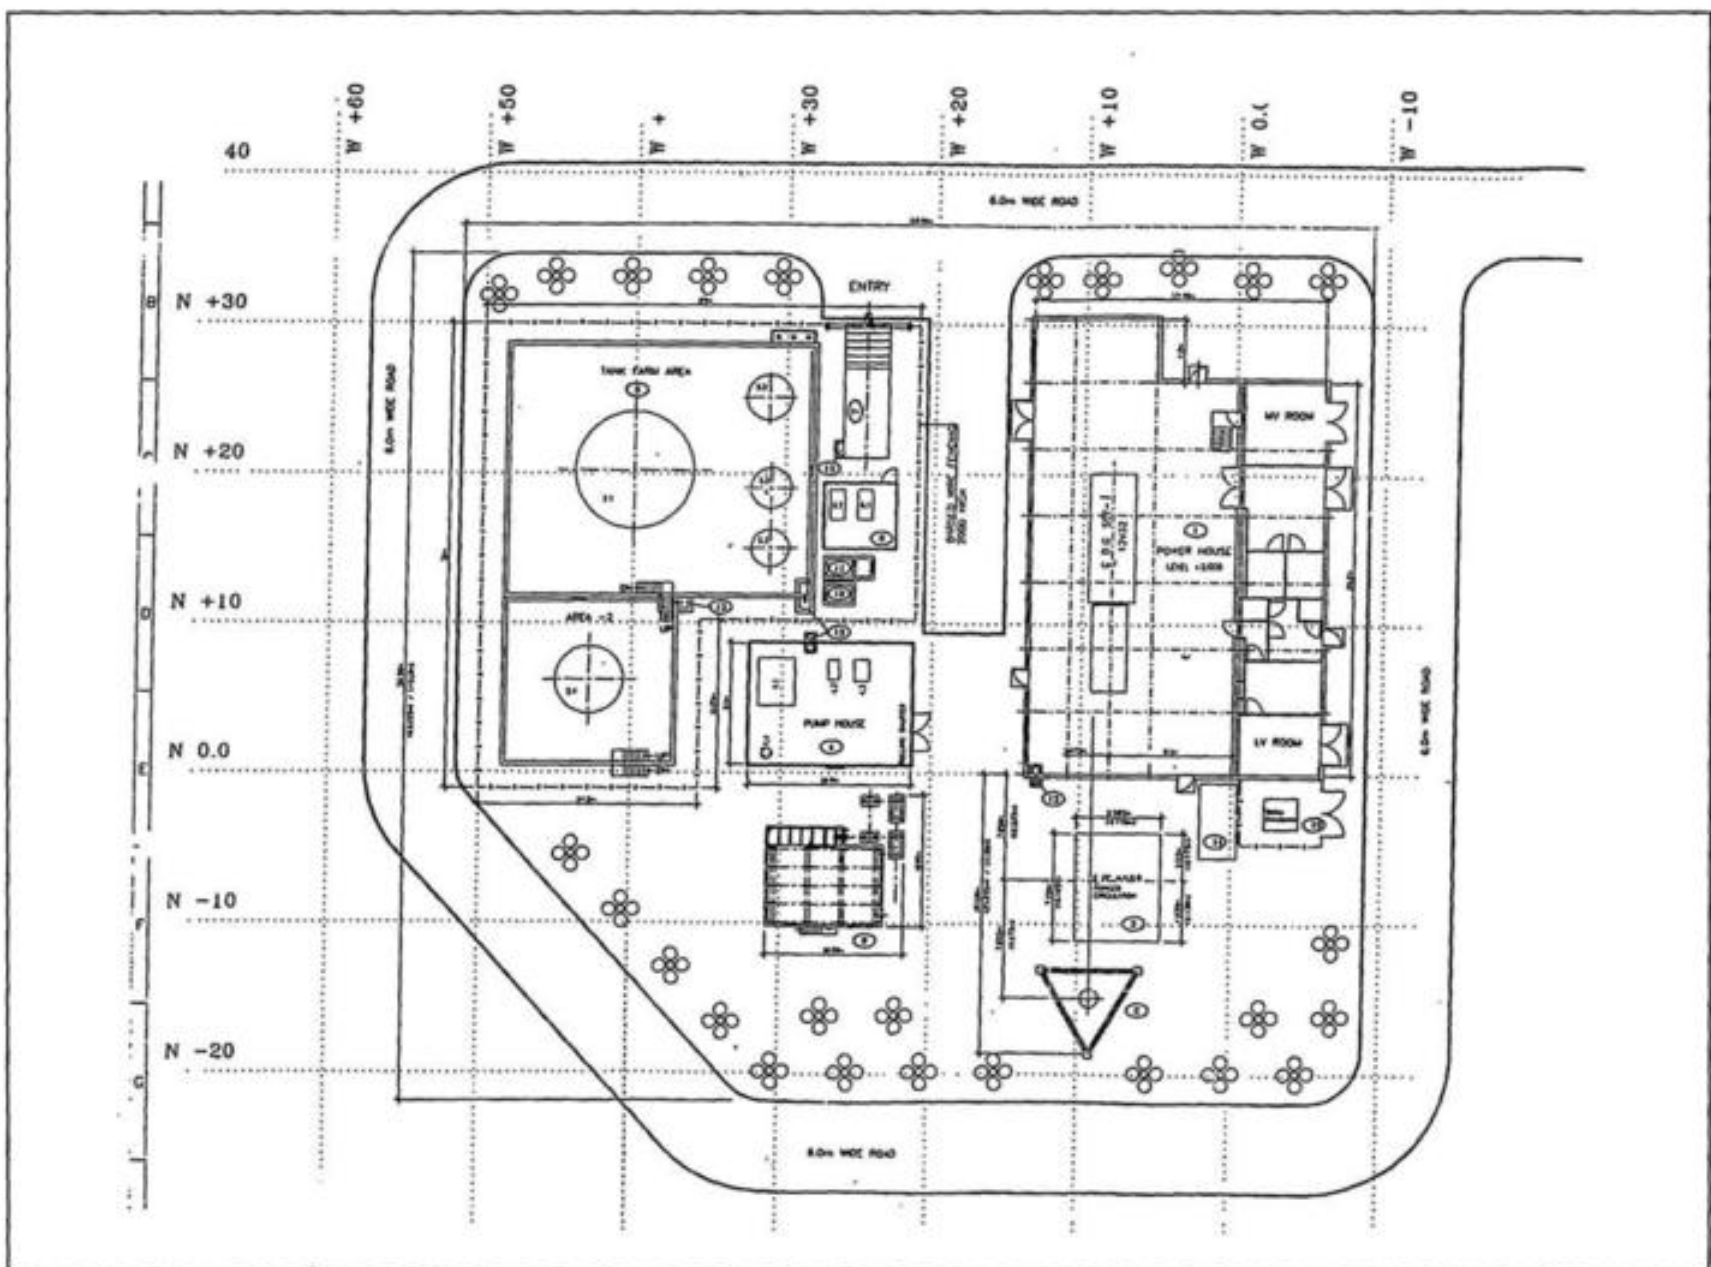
Typical layout of a D. G. set installation and oil storage.
